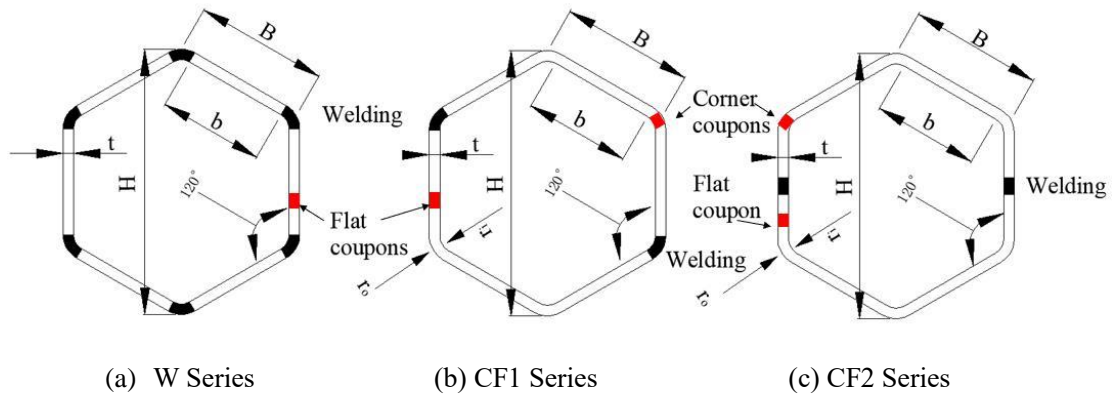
Cross sectional views of the examined regular hexagonal specimens
